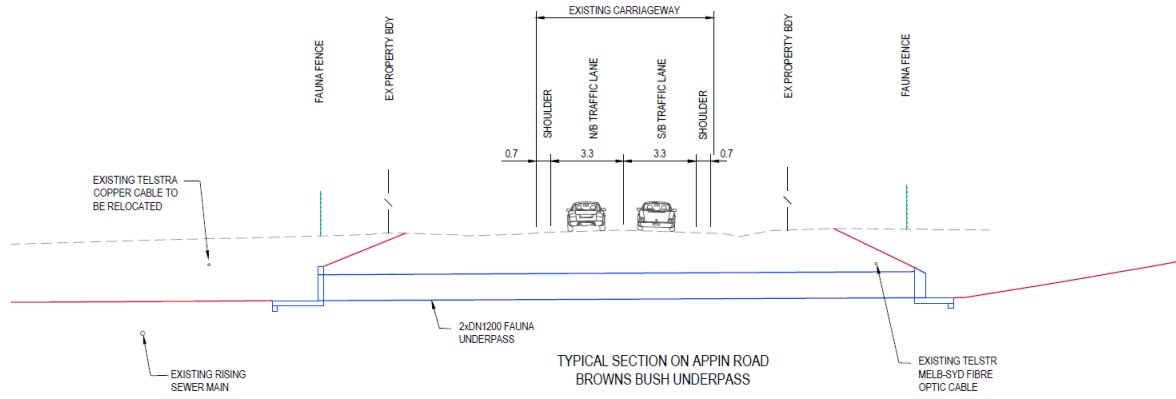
Concept design showing typical section on Appin Road Browns Bush underpass.
